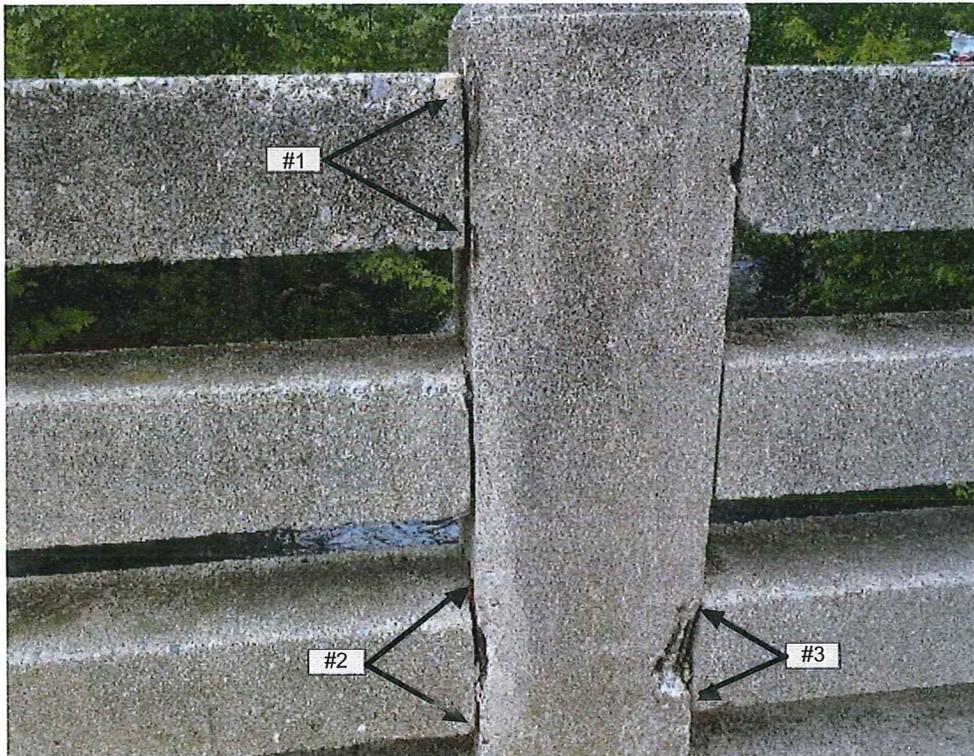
Railing - North railing middle post, three (3) minor spalls with rusted rebar exposed due to insufficient cover.
